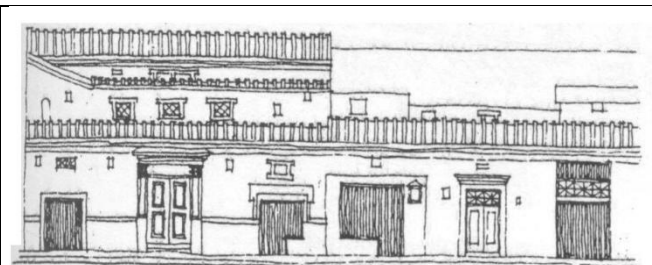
Street elevation of a Roman house (Source: 6000 years of Housing by Norbert Schoenauer)
